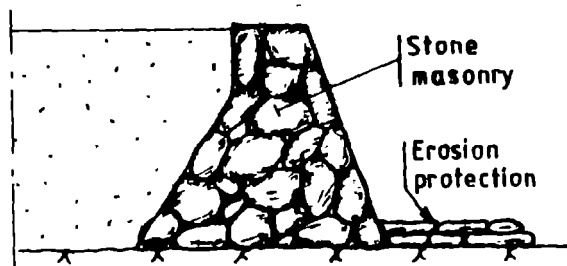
Stone masonry sand-storage dam (Nilsson 1984).
